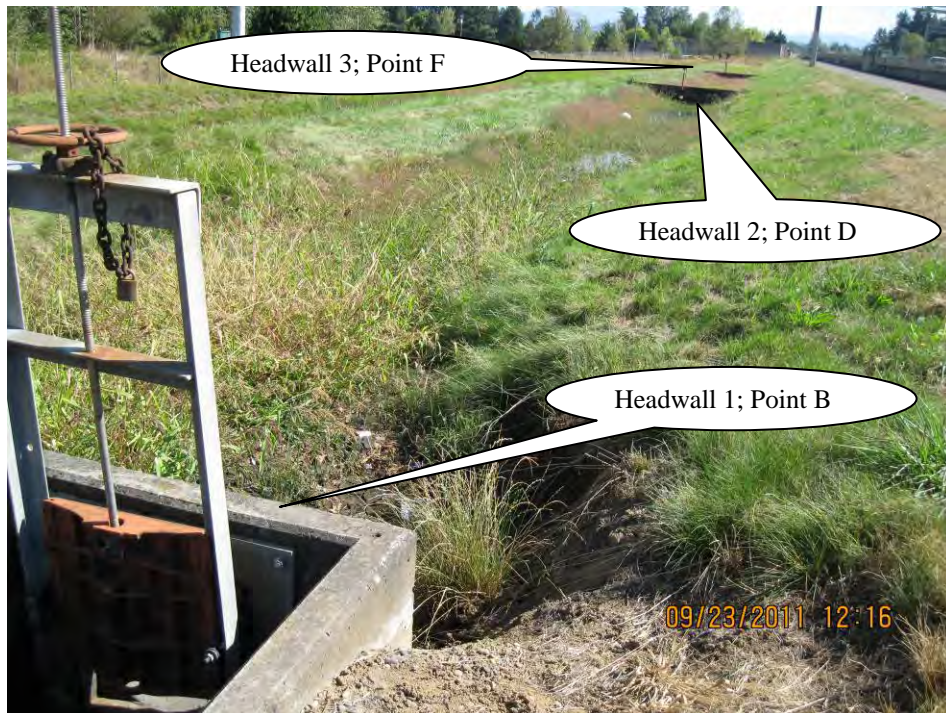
Looking east at overall view of diversion box (sediment vault) near facility inlet at headwalls 2 and 3; Points A, B, D and F of Operational Plan, Appendix A.
